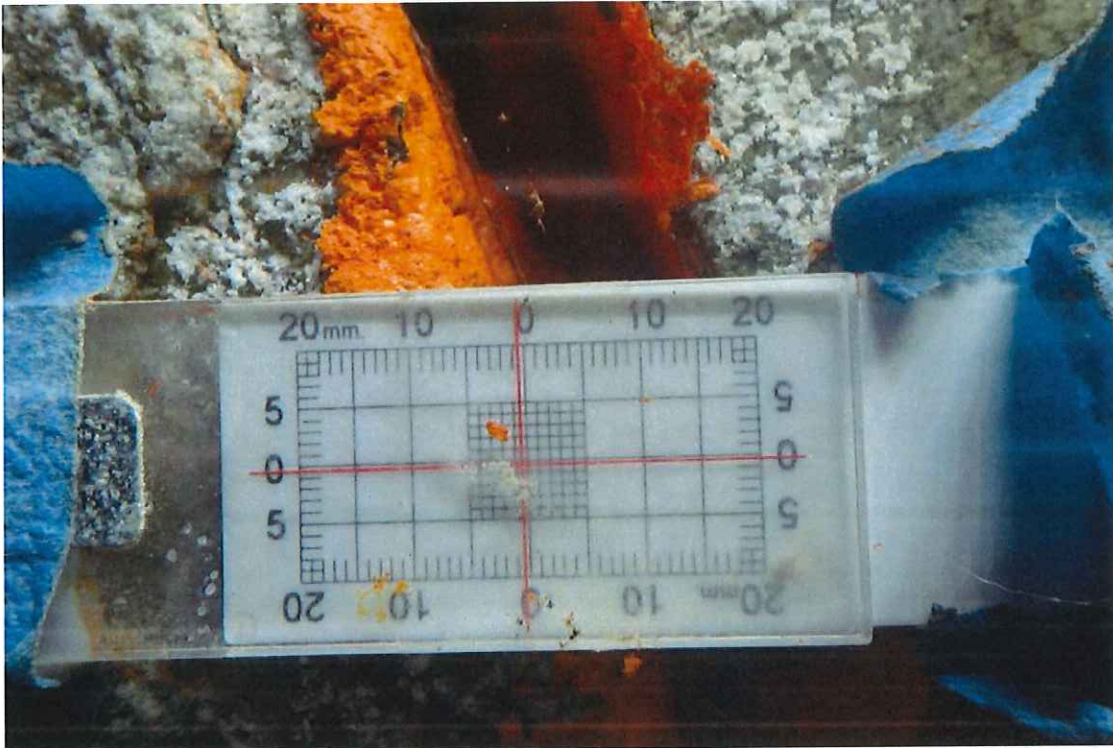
Granite slab 7: The crack gauge shows minor movement (< 1 mm).
